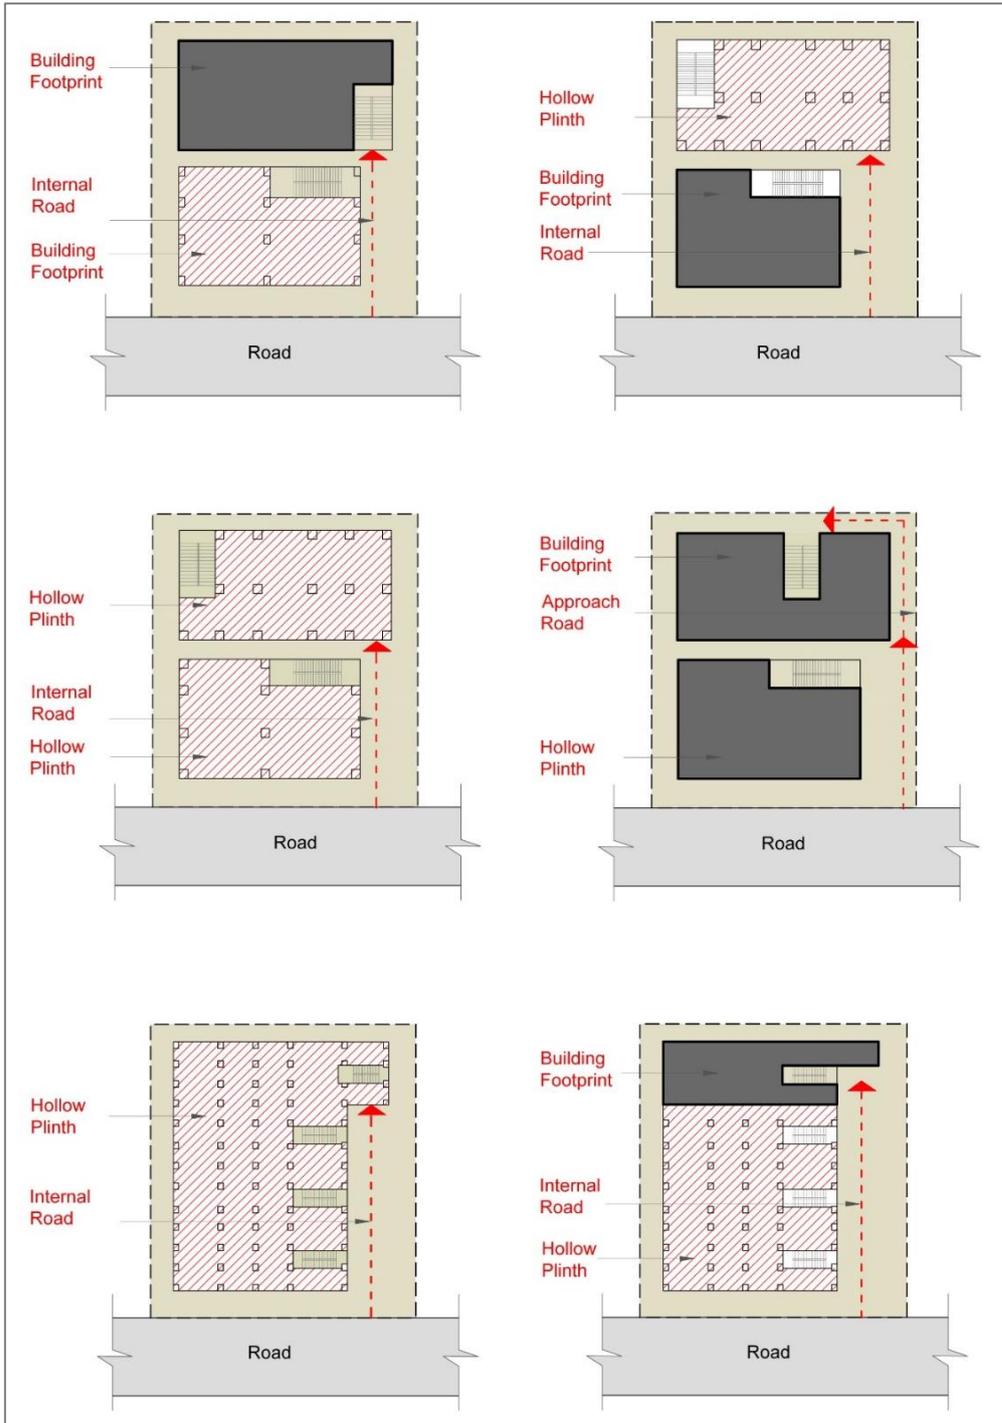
Internal Road and Approach to Building and Common Plot
